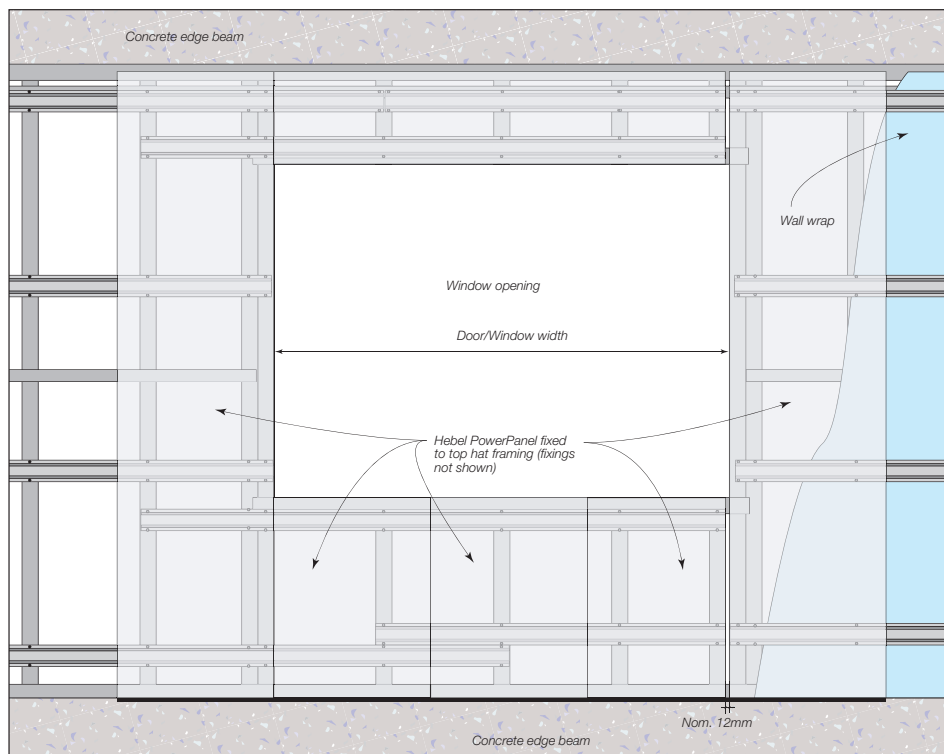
Window Opening Detail (Visible Edge Beam shown)
